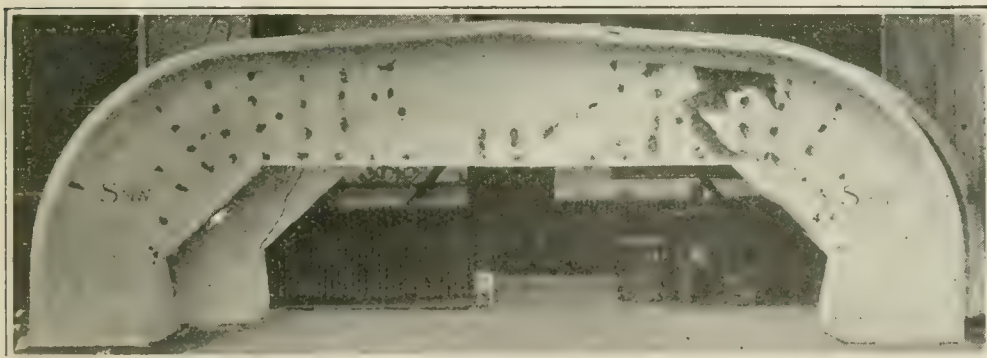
VIEW OF SHIP FRAME AFTER TEST; CRACKS PAINTED.
